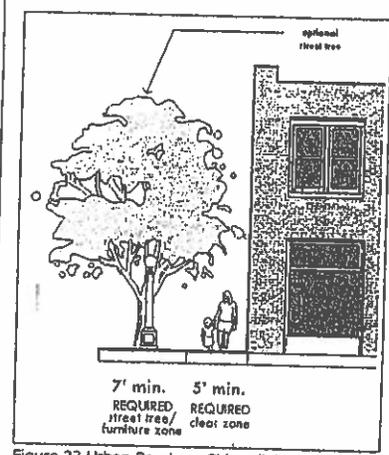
Urban Roadway Sidewalk Width Requirements from City of Austin Site Development Standards, Subchapter E: Design Standards and Mixed Use, Amended 2007
